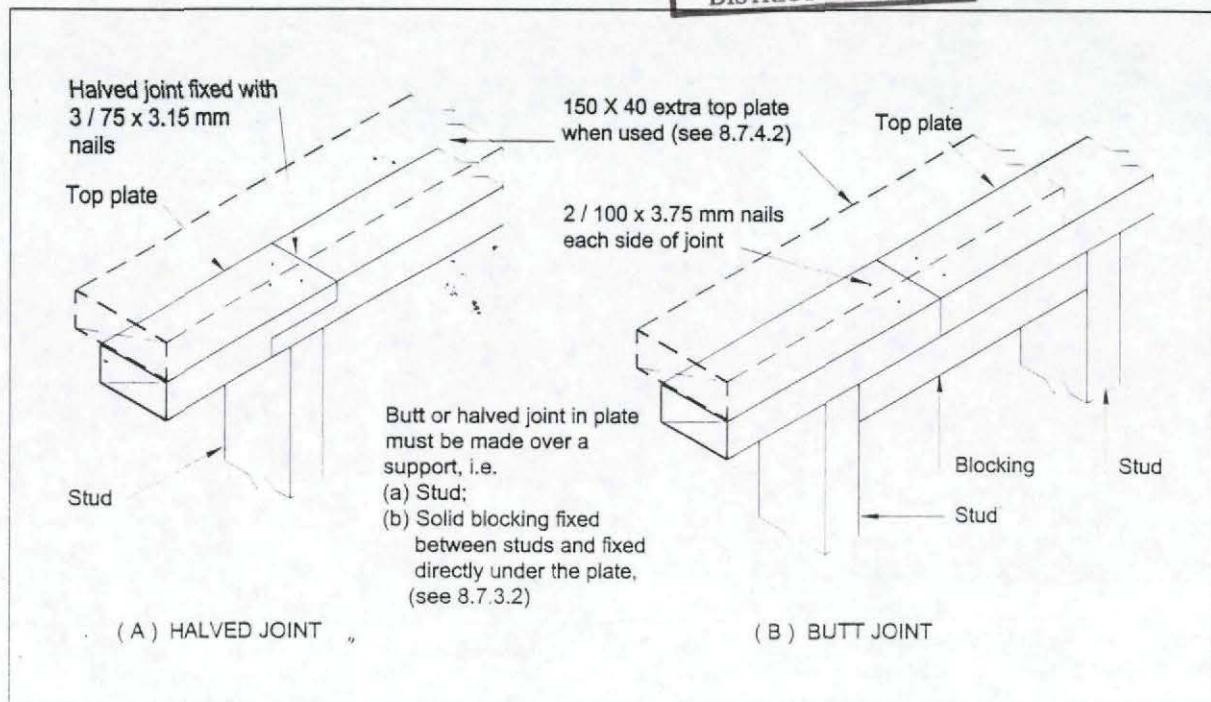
Connecting top plates – Walls not containing bracing (see 8.7.3.2)
